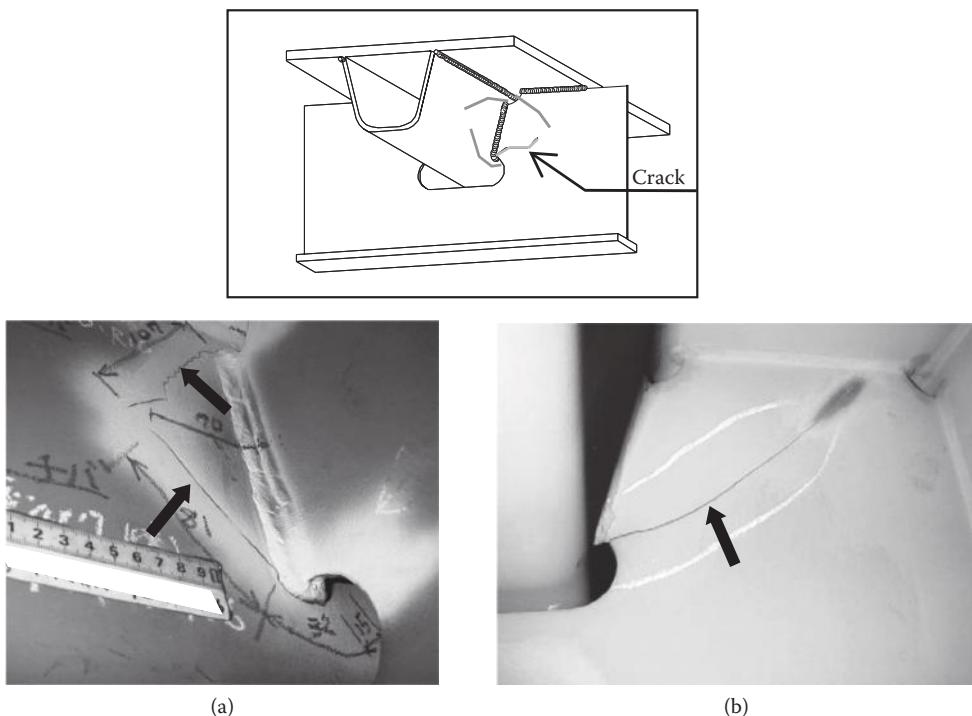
Fatigue cracks initiated in the connection between longitudinal ribs and transverse ribs (DR- and DS-type fatigue cracks): (a) DR1, DR2 type fatigue cracks; (b) DS2 type fatigue cracks.
